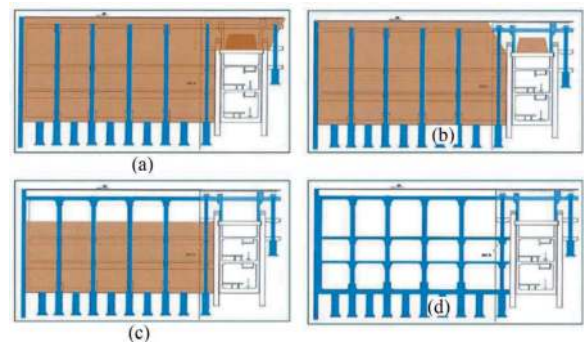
Construction sequences of top-down excavation: (a) Construction of diaphragm wall and structural columns; (b) Excavation of soil overlaying Line 7 station; (c) Excavation of new station area in layers and construction of structural slab; (d) Top-down excavation to base level.
